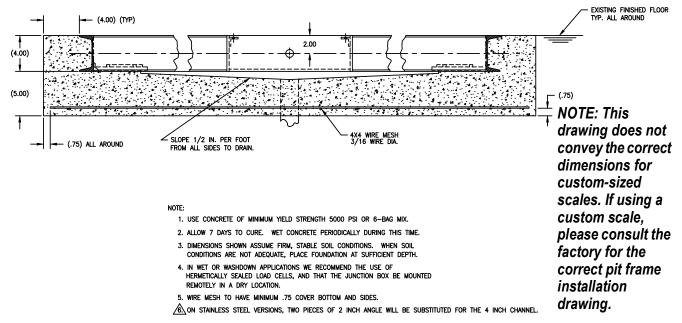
Installed Summit SD-1150-WP and Pit Frame Section
